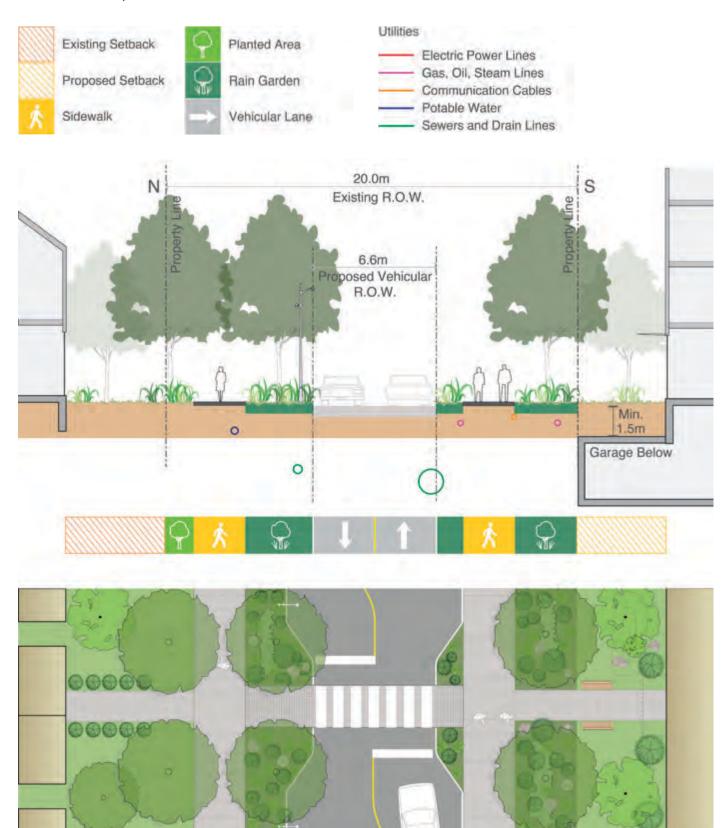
Section and Plan of Keewatin Greenway - Recommended Final Condition at mid-block raised crossing bump-out
